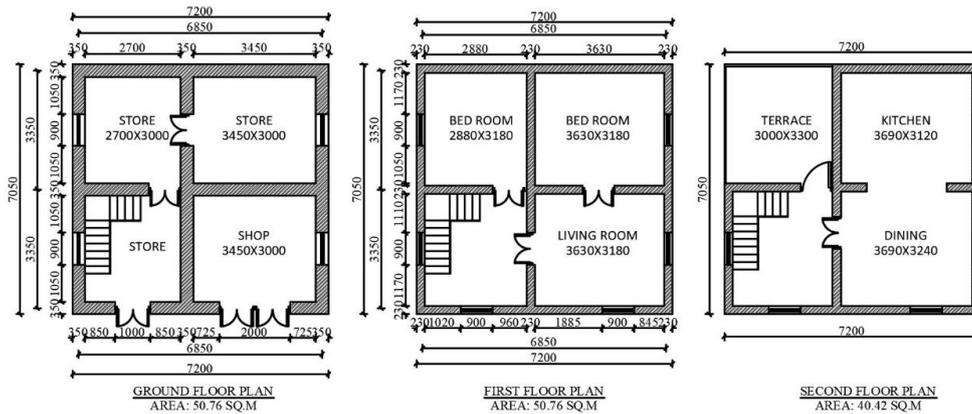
Ground floor, first floor & second floor plan BMC 2.4 LB
